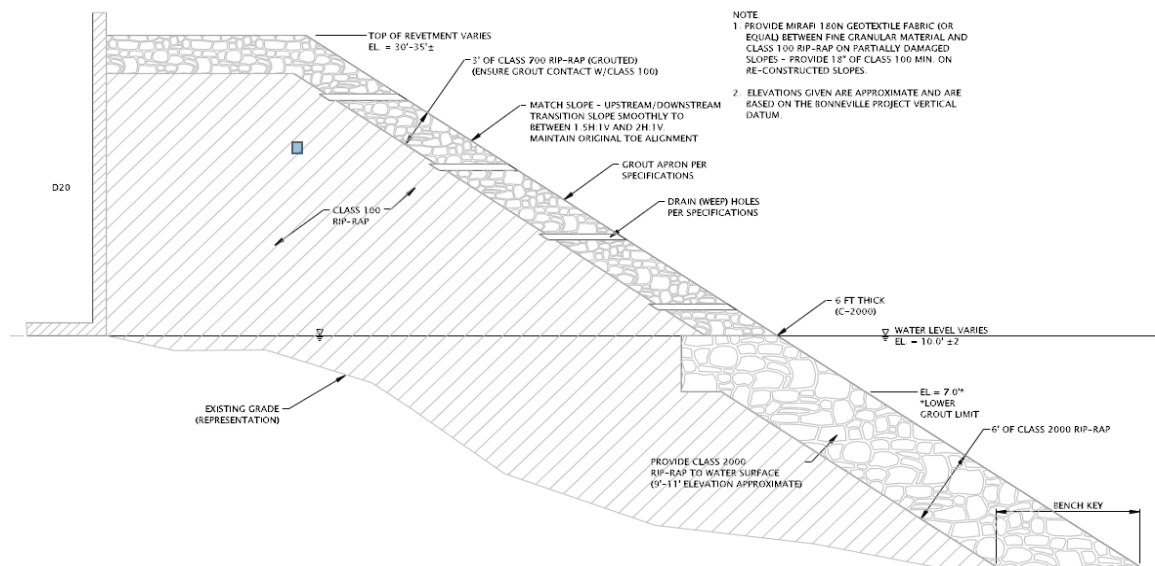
Bonneville B-Branch Fish Ladder 2011 Repair
